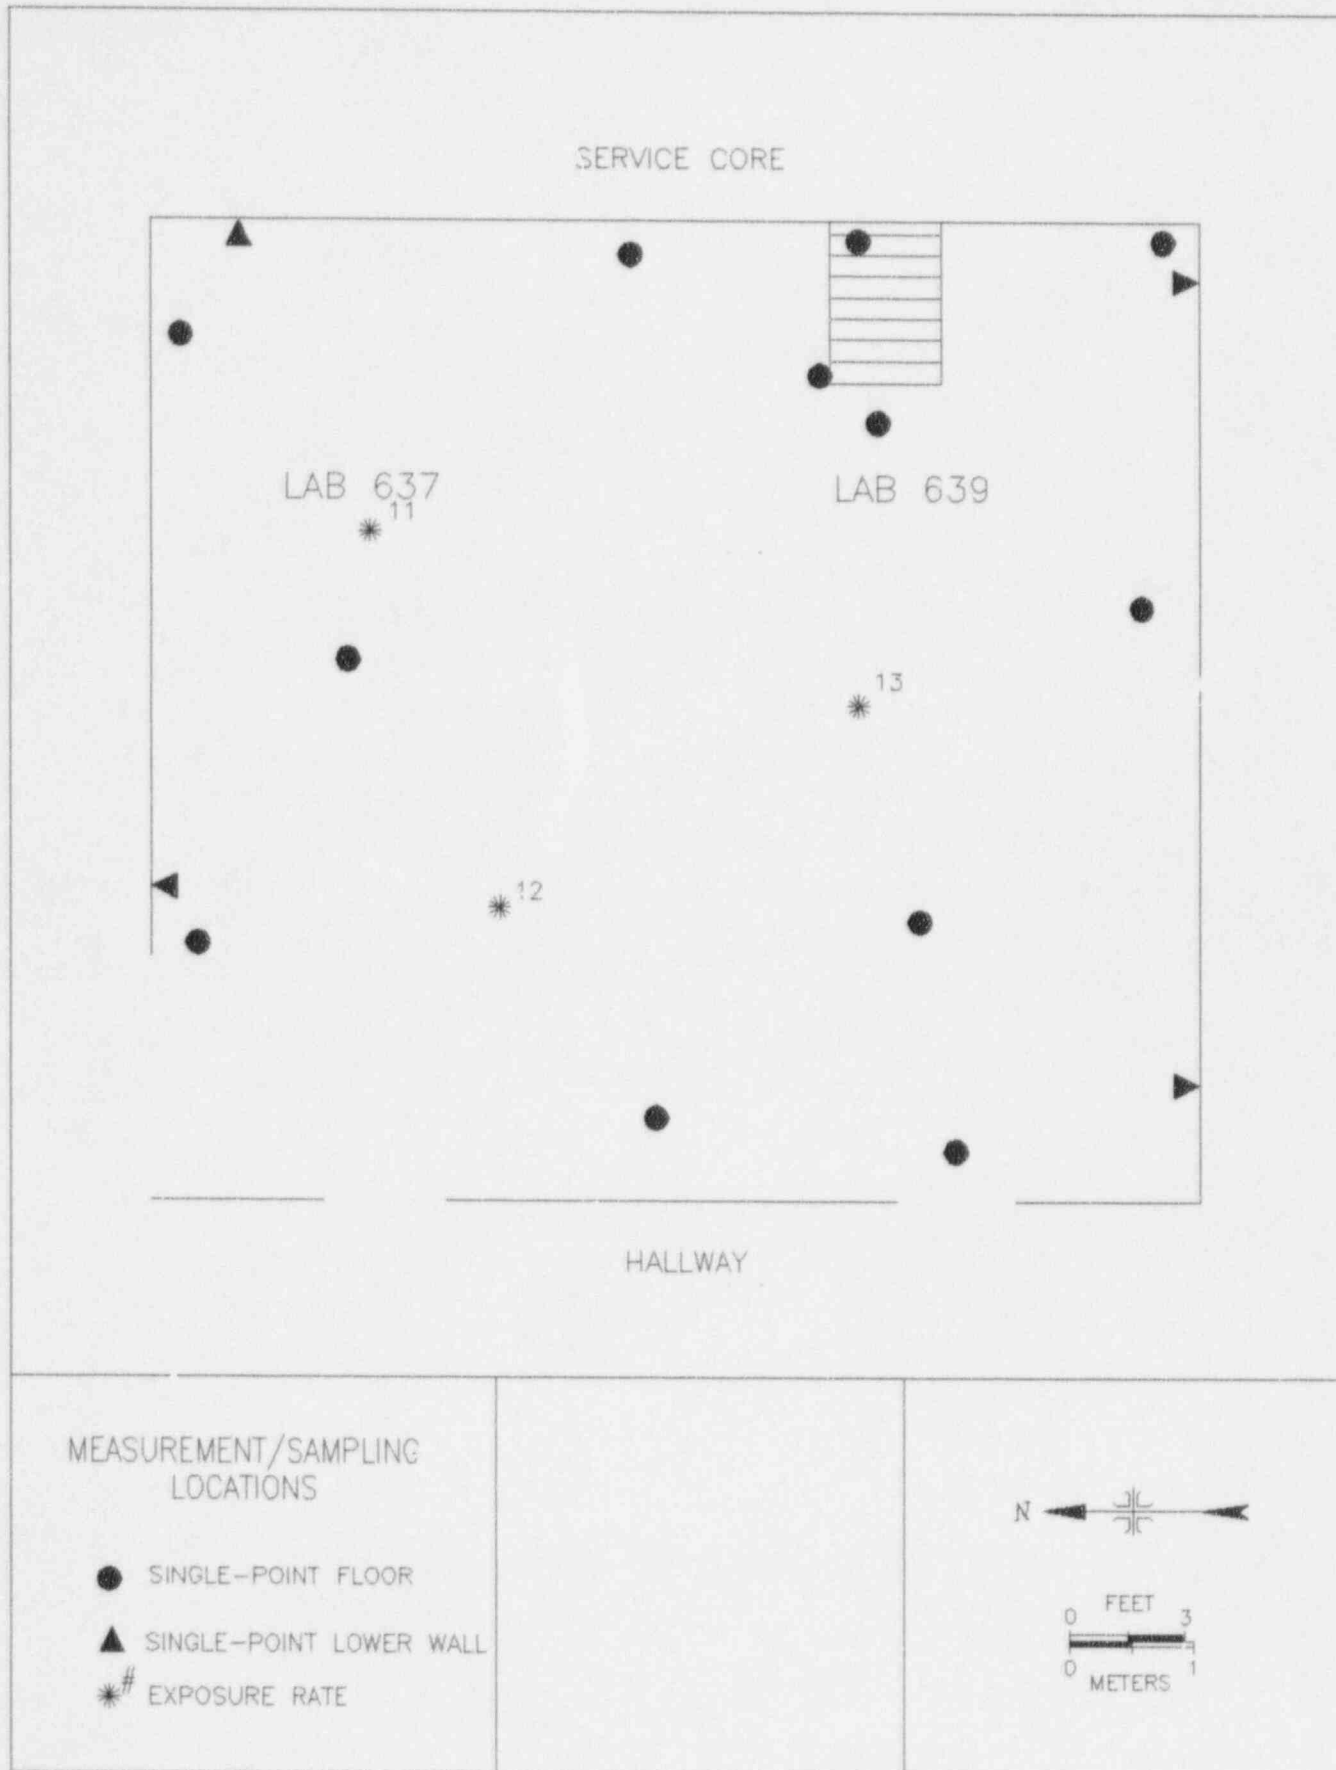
Building 2, Rooms 637/639 - Measurement and Sampling Locations
